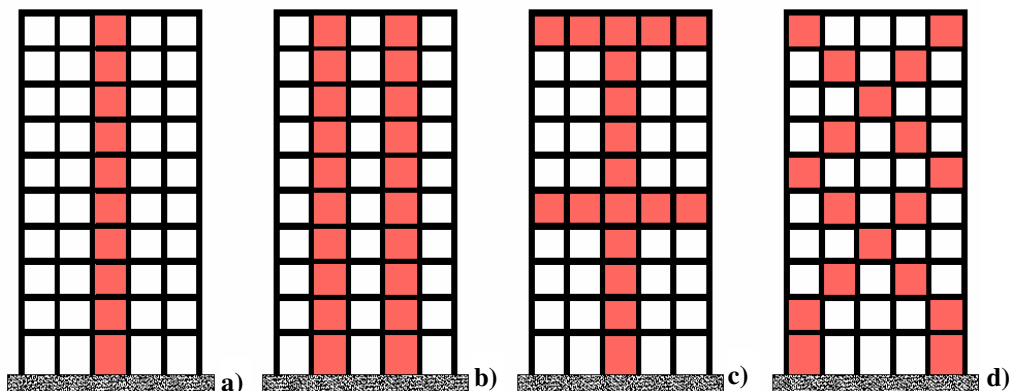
Structural configurations of shear walls: a) single wall; b) coupled walls; c) out-rigger walls and d) mega-truss (or mega-frame) walls
